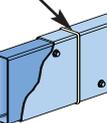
B. BOTTOM BRACING ASSEMBLY
